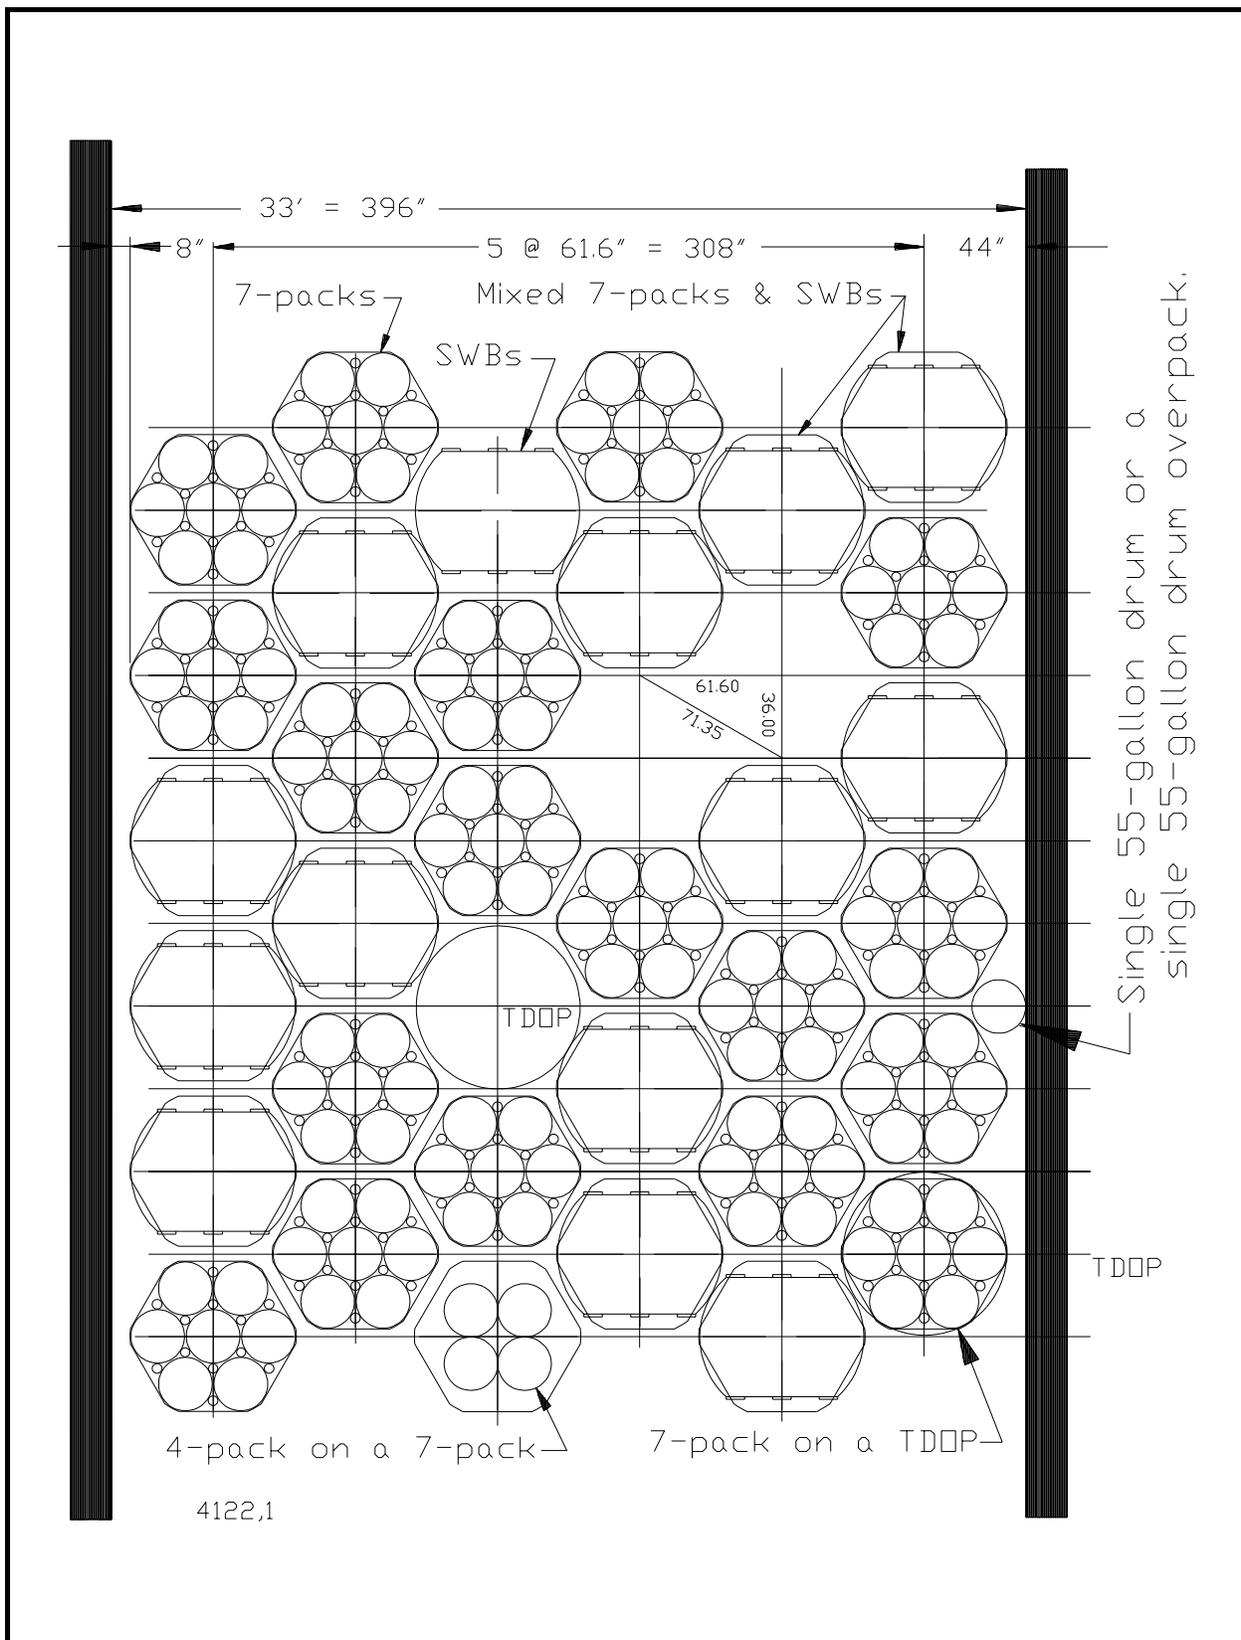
, Arrangement of Typical Waste Stacks
